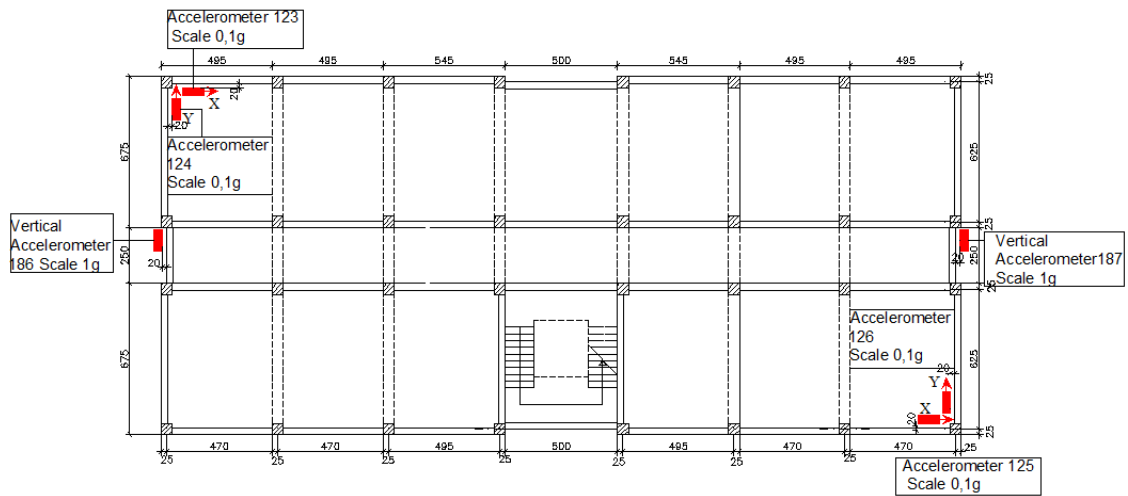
Arrangement of the accelerometers on the last floor for the first configuration
